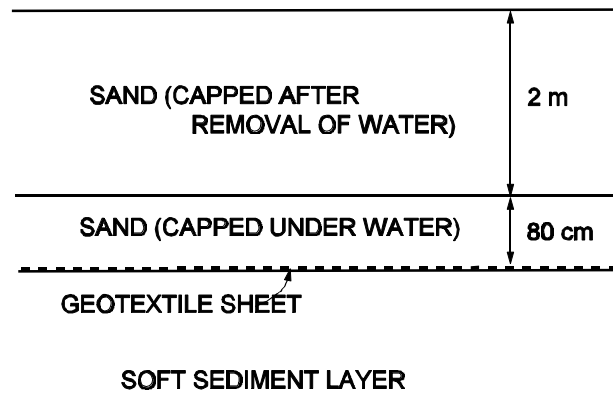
Configuration of Sand Cap at Minamata Site (after Namba, 1994)
